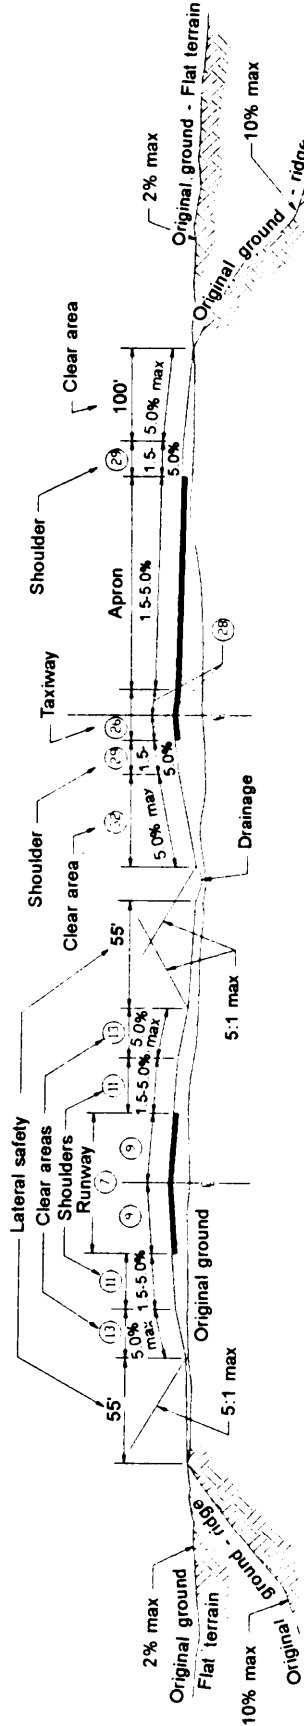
Typical runway, taxiway, and parking apron cross section
